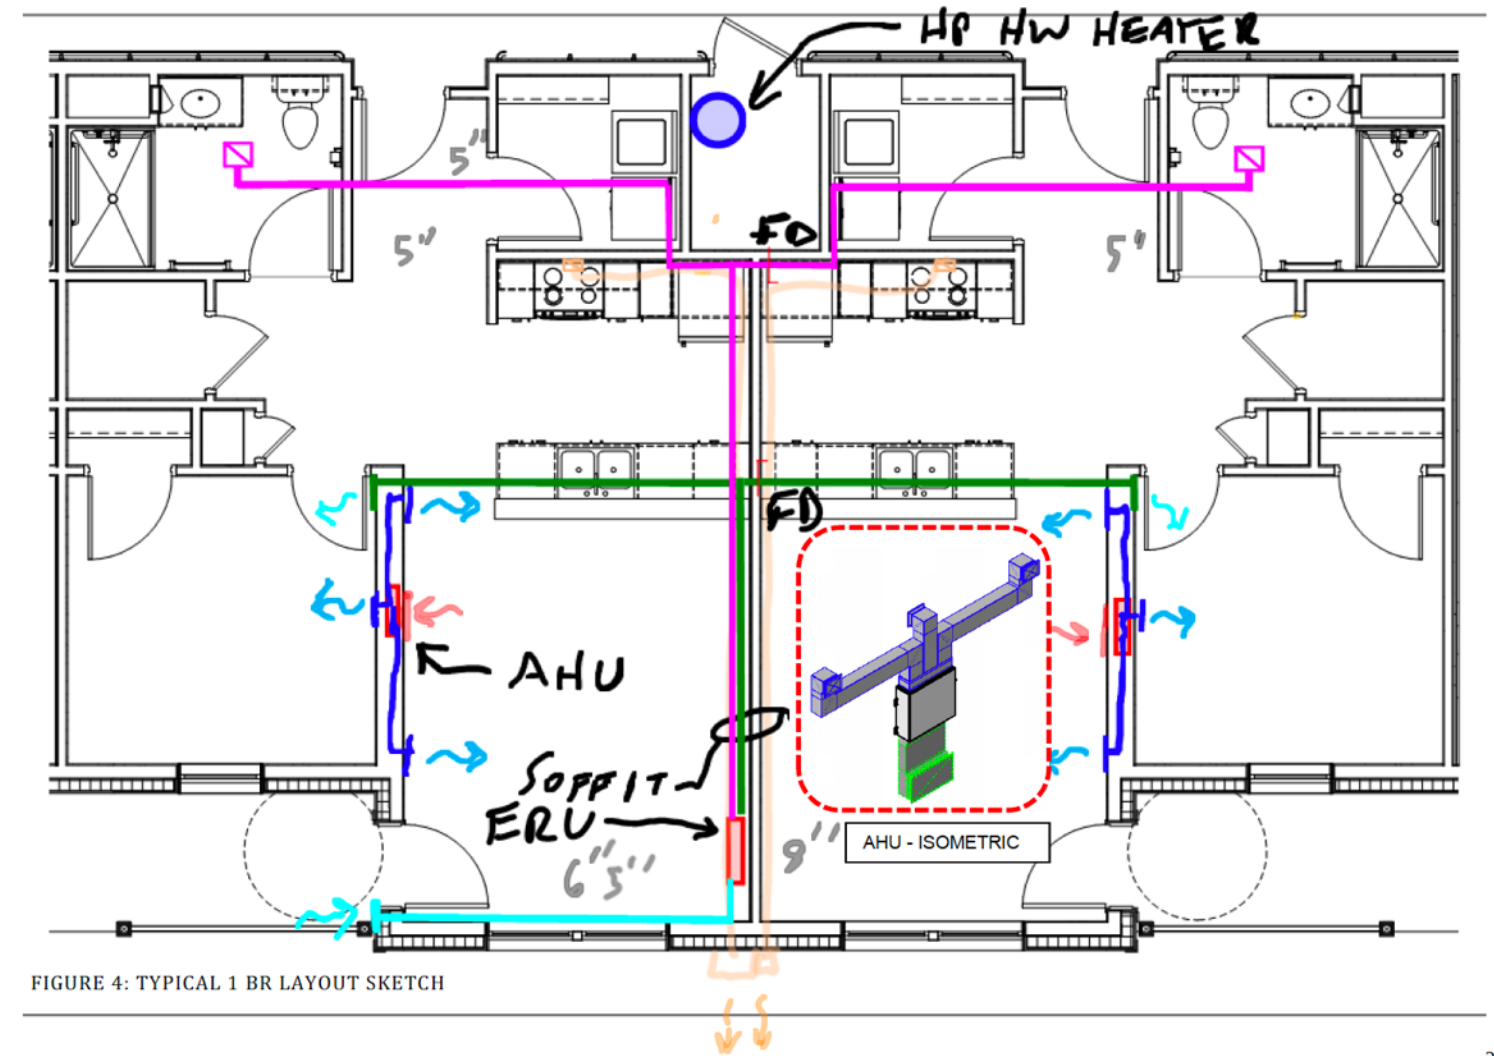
TYPICAL 1 BR LAYOUT SKETCH
